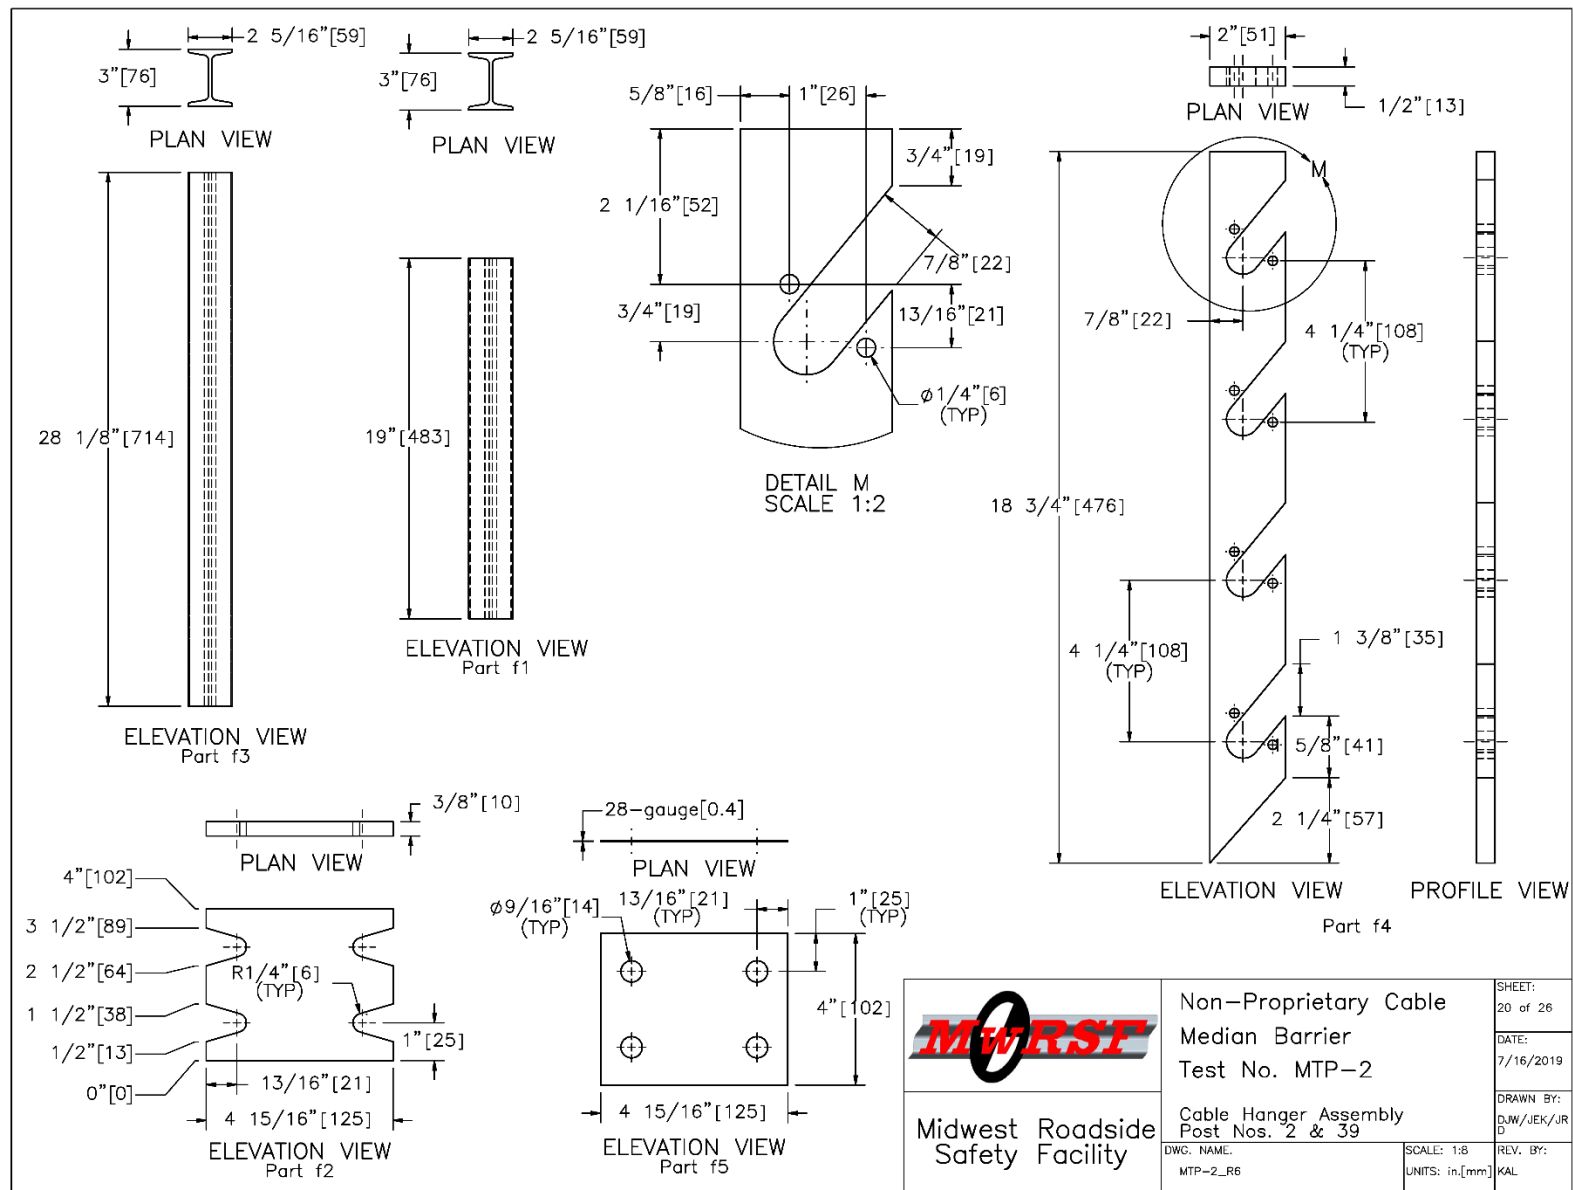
Cable Hanger Assembly Post Nos. 2 and 39, Test No. MTP-2
